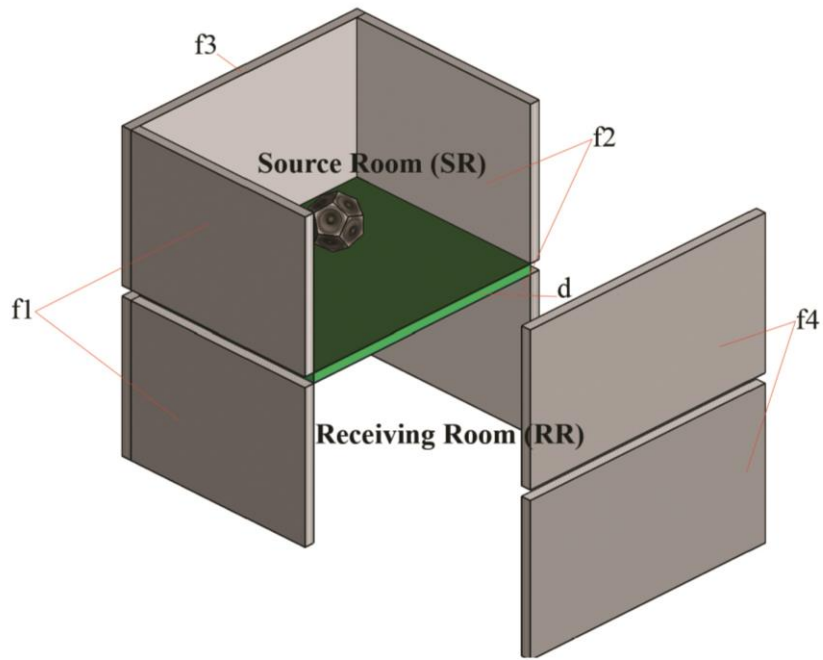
A modelling of TV-FR2 as a source room and TV-GR1 as a receiving room in Tahtacıörencik Village House analysed by BASTIAN to determine airborne and impact sound transmission characteristics of Original-Floor 4.
